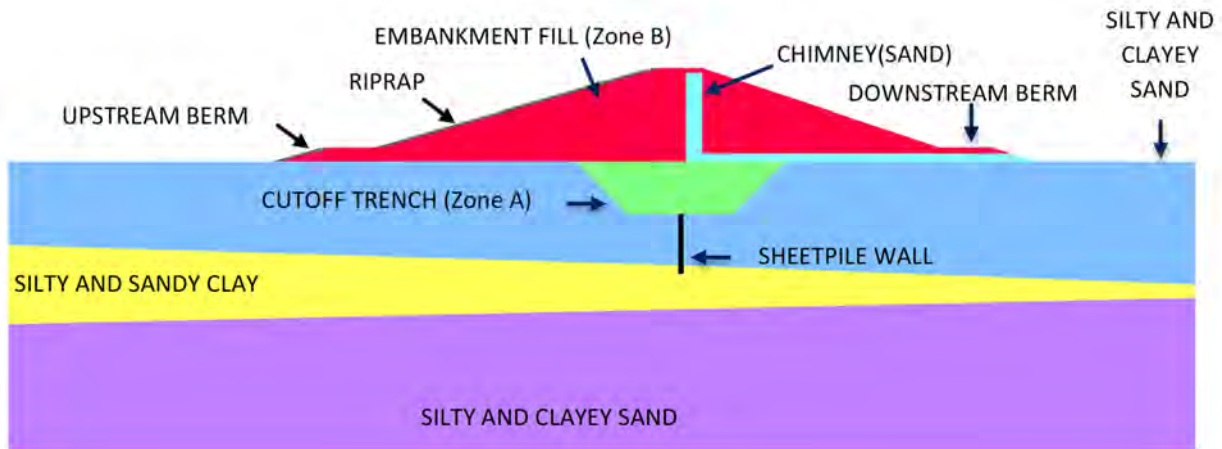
Typical Geometry and Zonation for Alternative 1—Birch
